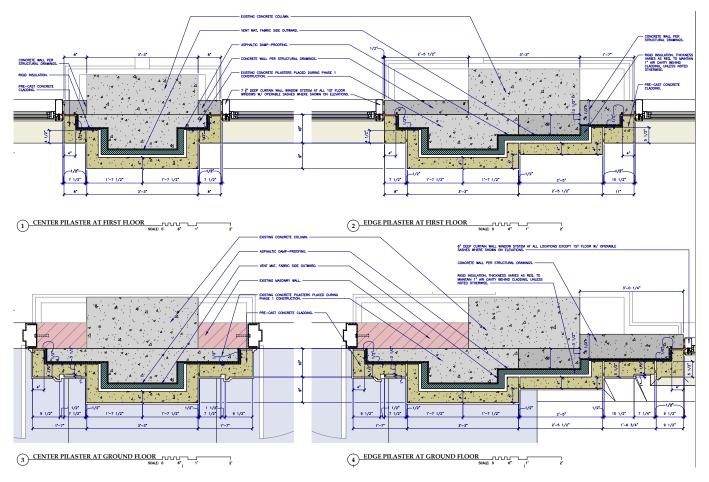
Detailed Plan of Portico Corrective Work, Ground & 1st Floor
